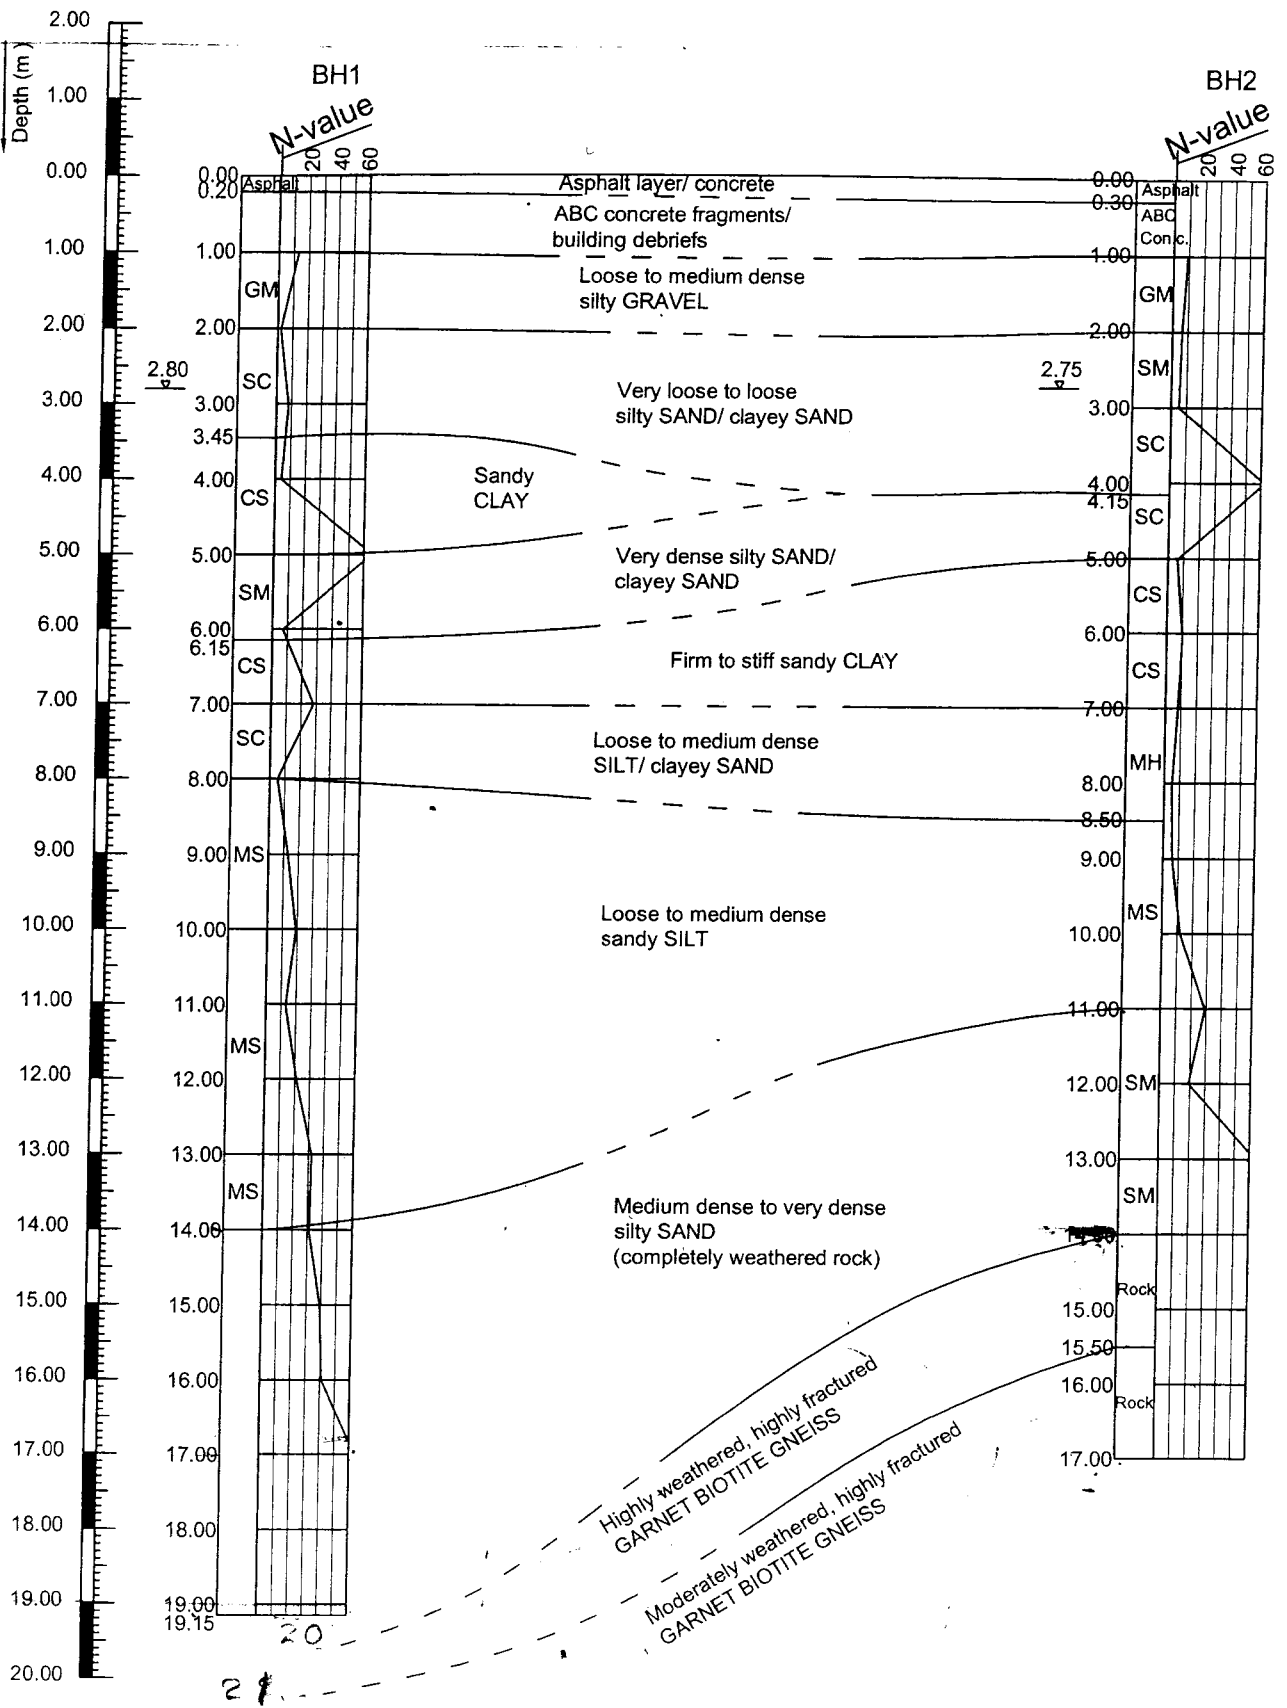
Figure II :- Assumed vertical sub-soil profile through BH 01 and BH 02
